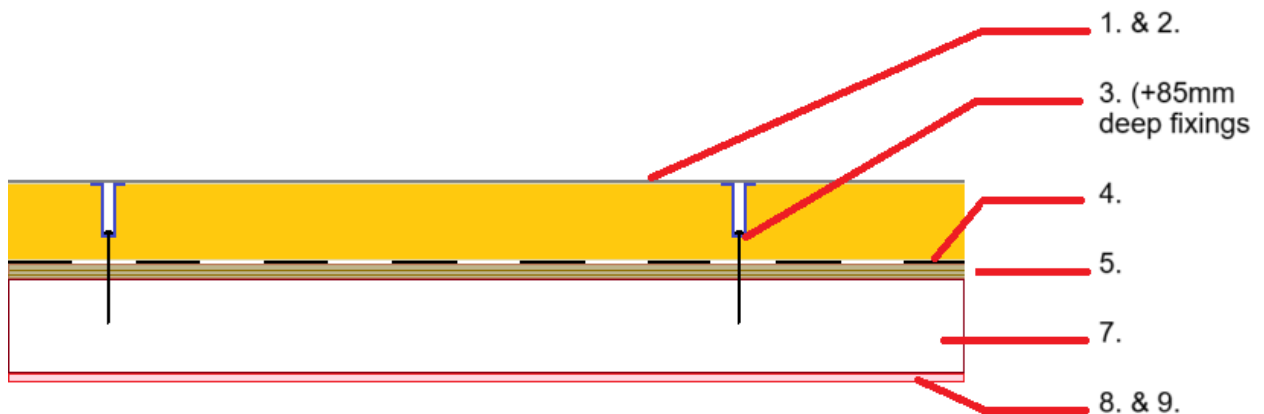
Construction type 1 – *thermally insulated* deck comprising 100 mm thick tissue-faced polyisocyanurate board mechanically fixed through an oriented strand board (OSB) deck (firrings not shown for ease of drawing)
